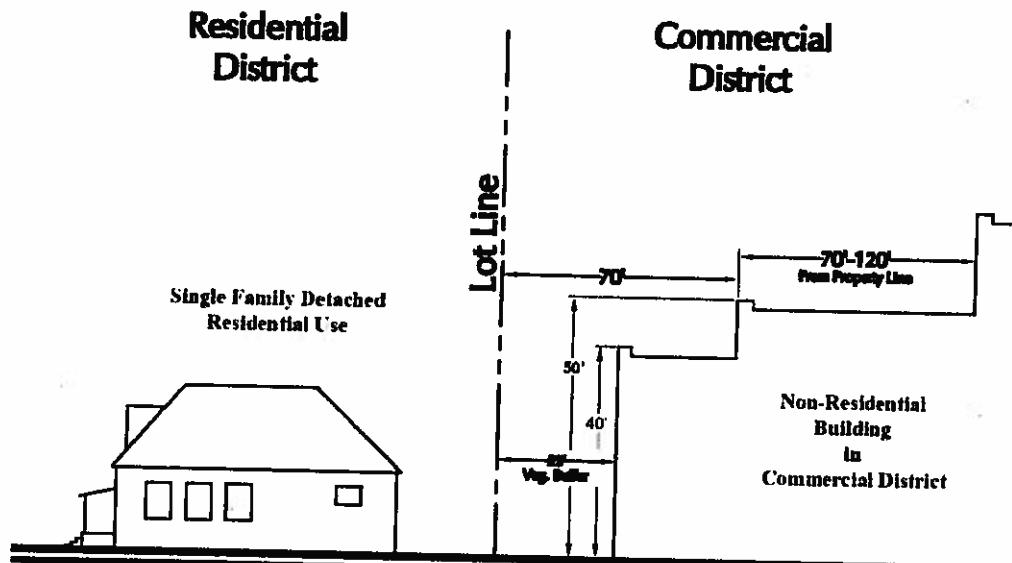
Height Restrictions between Single Family Detached Residential Use and Multifamily, Industrial or Commercial Use Building.
